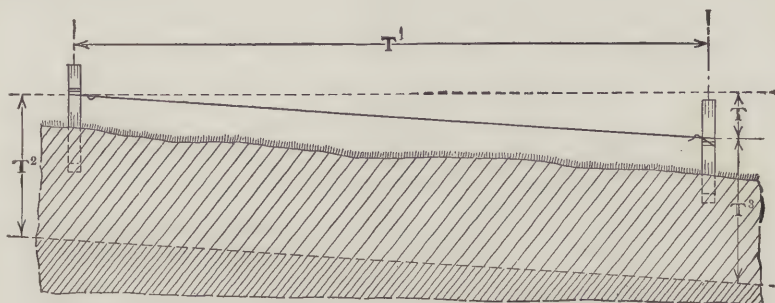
STAKE AND LINE GRADING BY SECTIONS—SIDE SECTIONAL VIEW
